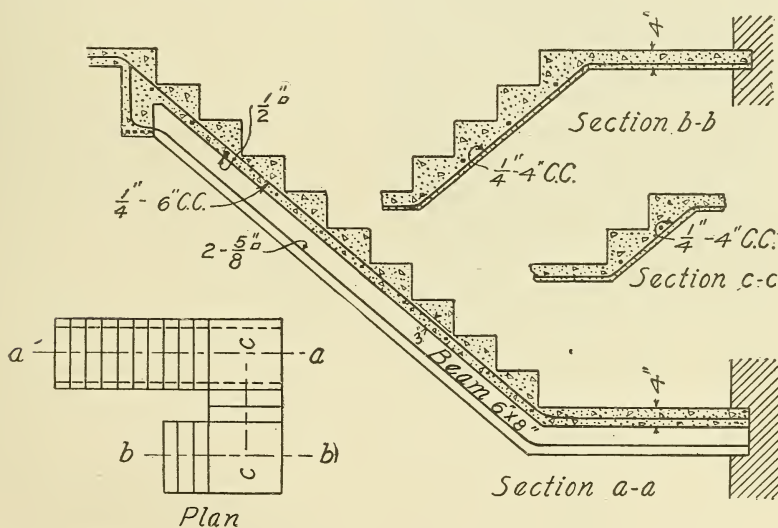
Stairway in Shop Building, Swarthmore College, Swarthmore, Pa.
